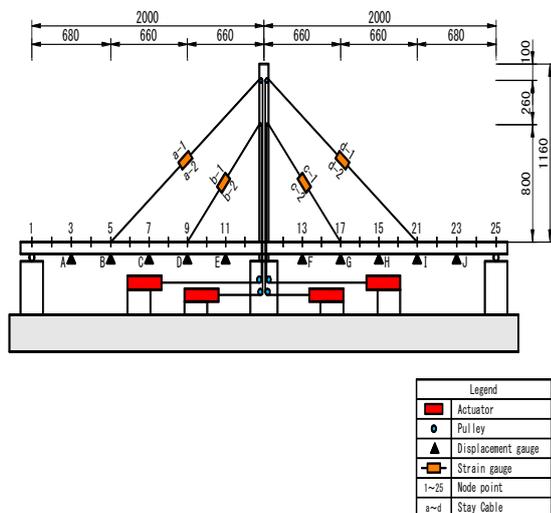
Composition of the cable-stayed bridge model (in mm)
